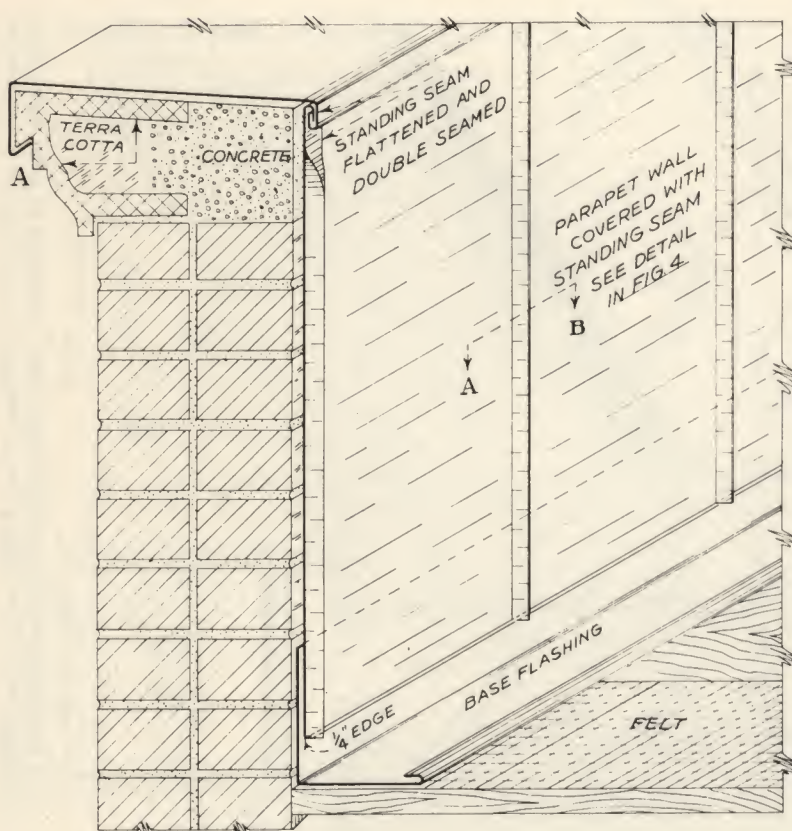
FLASHING BRICK PARAPET WALL AND TERRA COTTA COPING WHEN WALL IS OVER 16" ABOVE ROOF LINE SCALE - 1 1/2"=1'-0"
